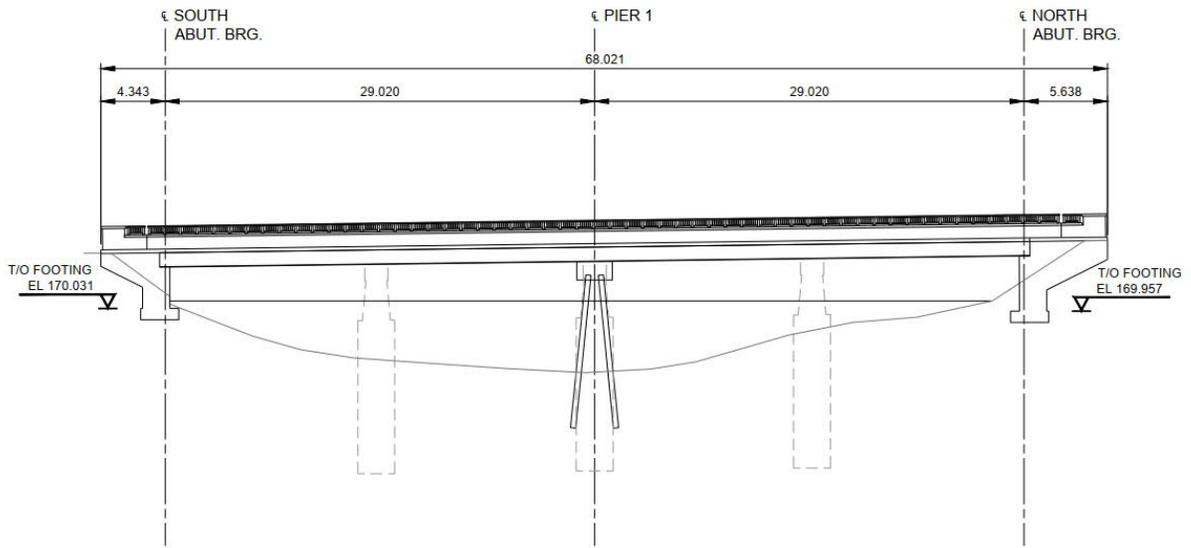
Proposed Elevation for Alternative Design Concept 1
